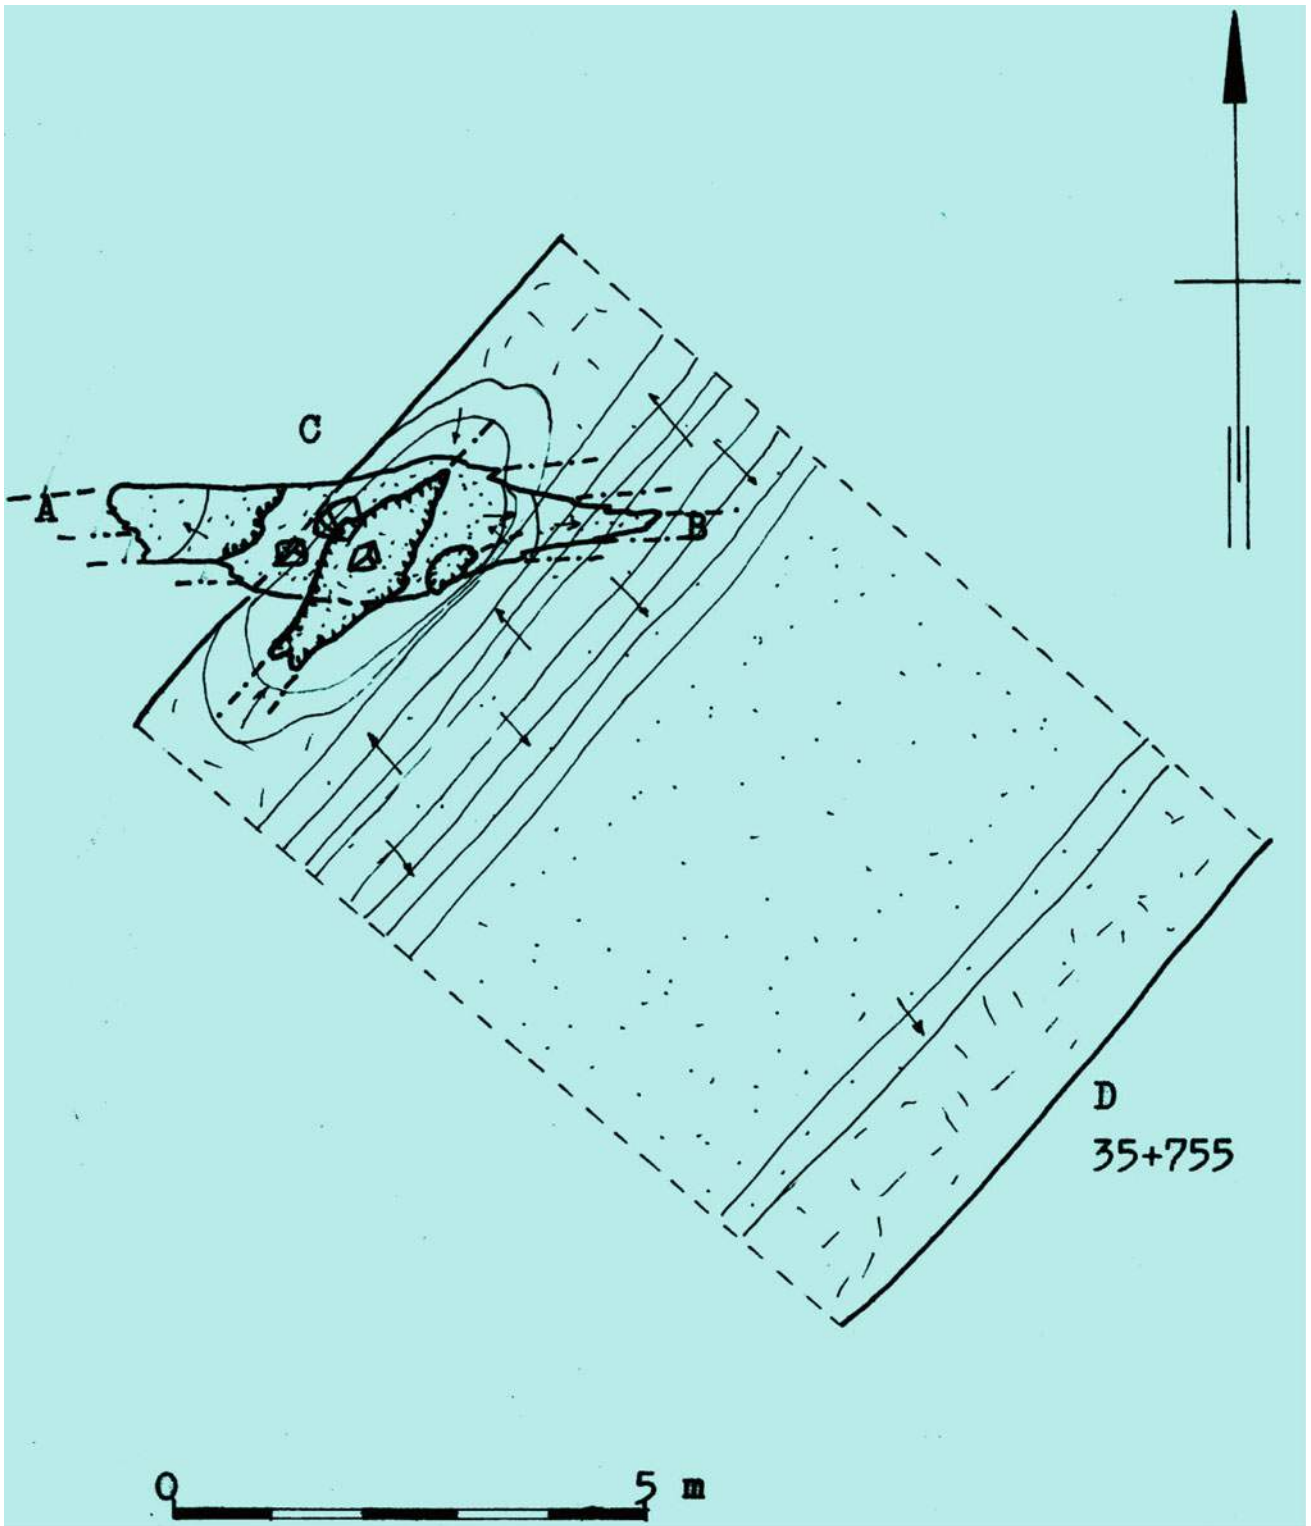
Plan of cavern at km 35 + 755 in Sleme Tunnel
